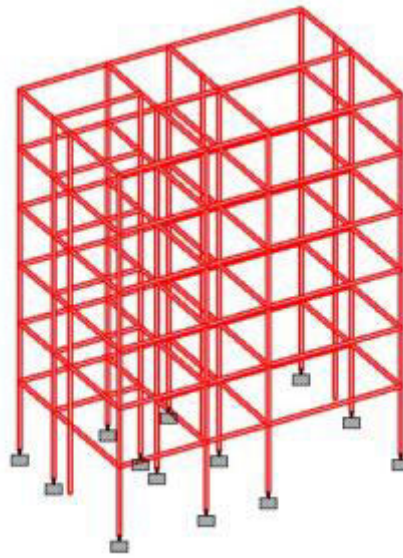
Three dimensional rendered view of the building from STAAD Pro
